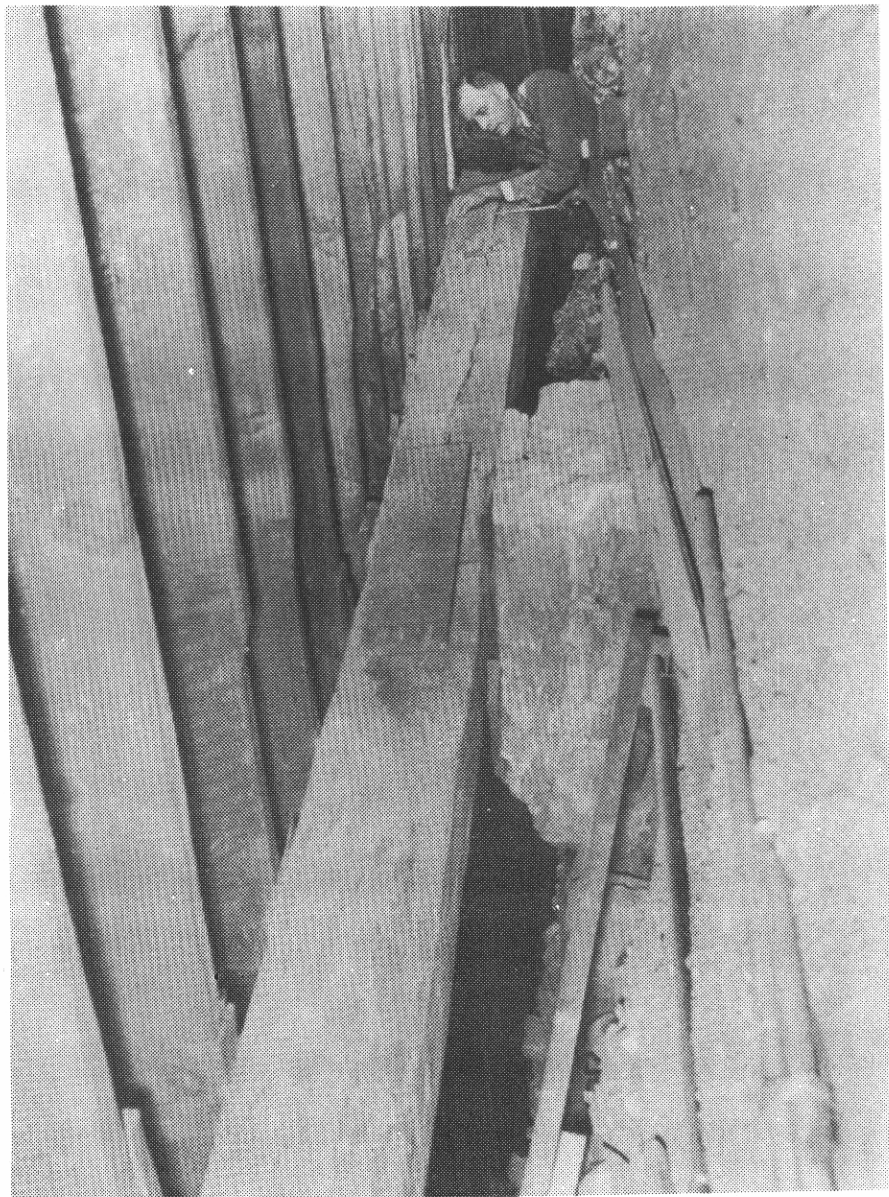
Hand-hewn white pine beams supporting the floor of St. Raphael's Cathedral, Madison Wis.
